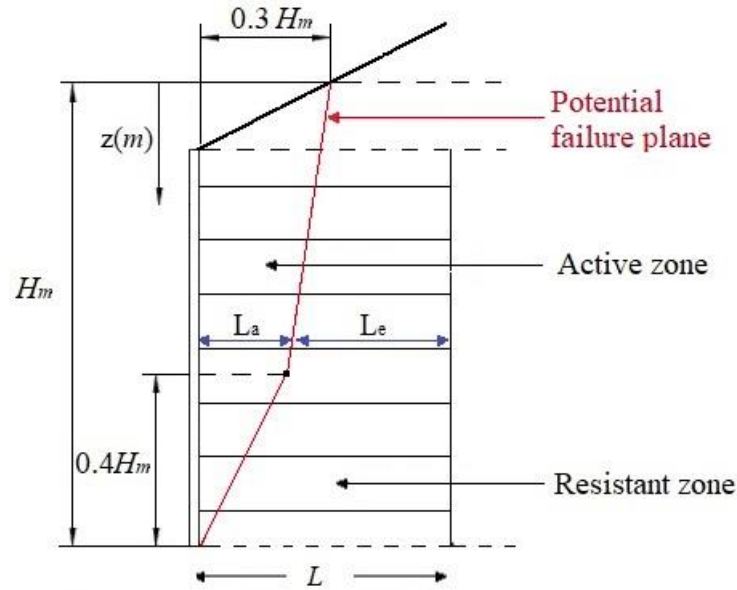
Location of potential failure surface for internal stability design of reinforced soil retaining walls (NF P 94-270, 2009)
